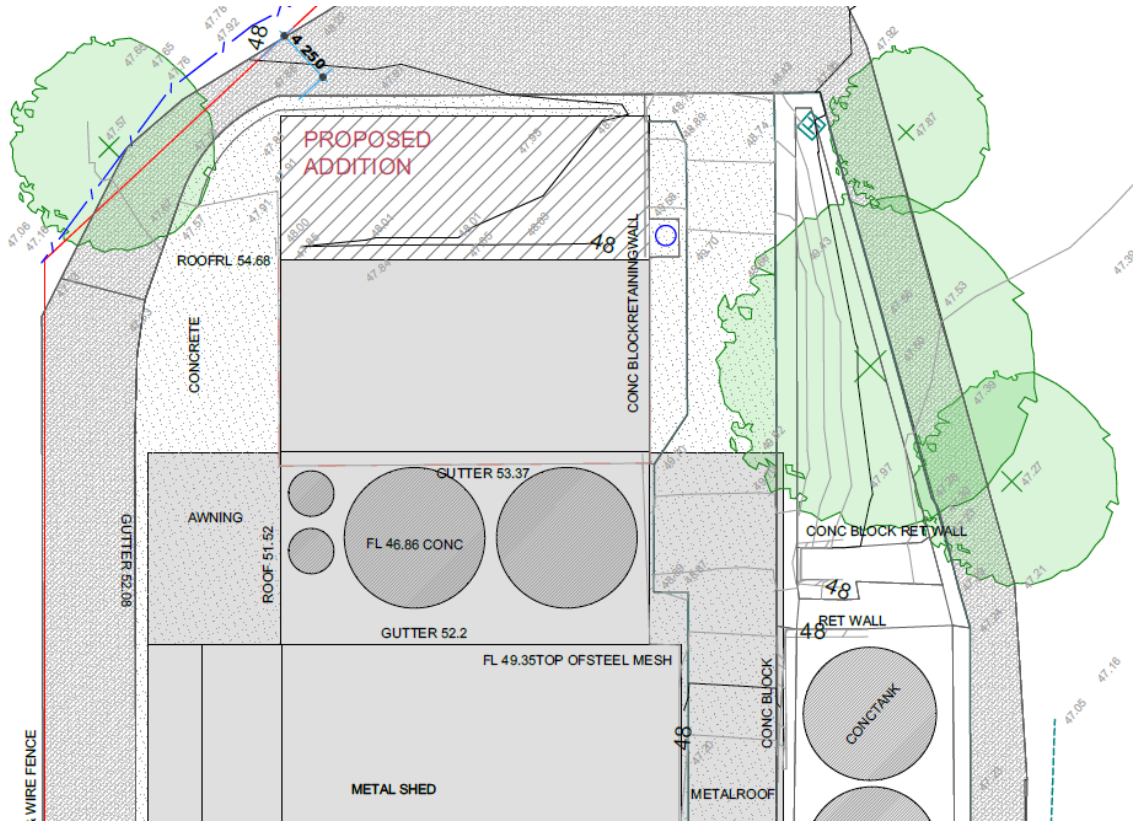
Extract of site plan showing location of awning addition (Source: Advantage, 2025).
